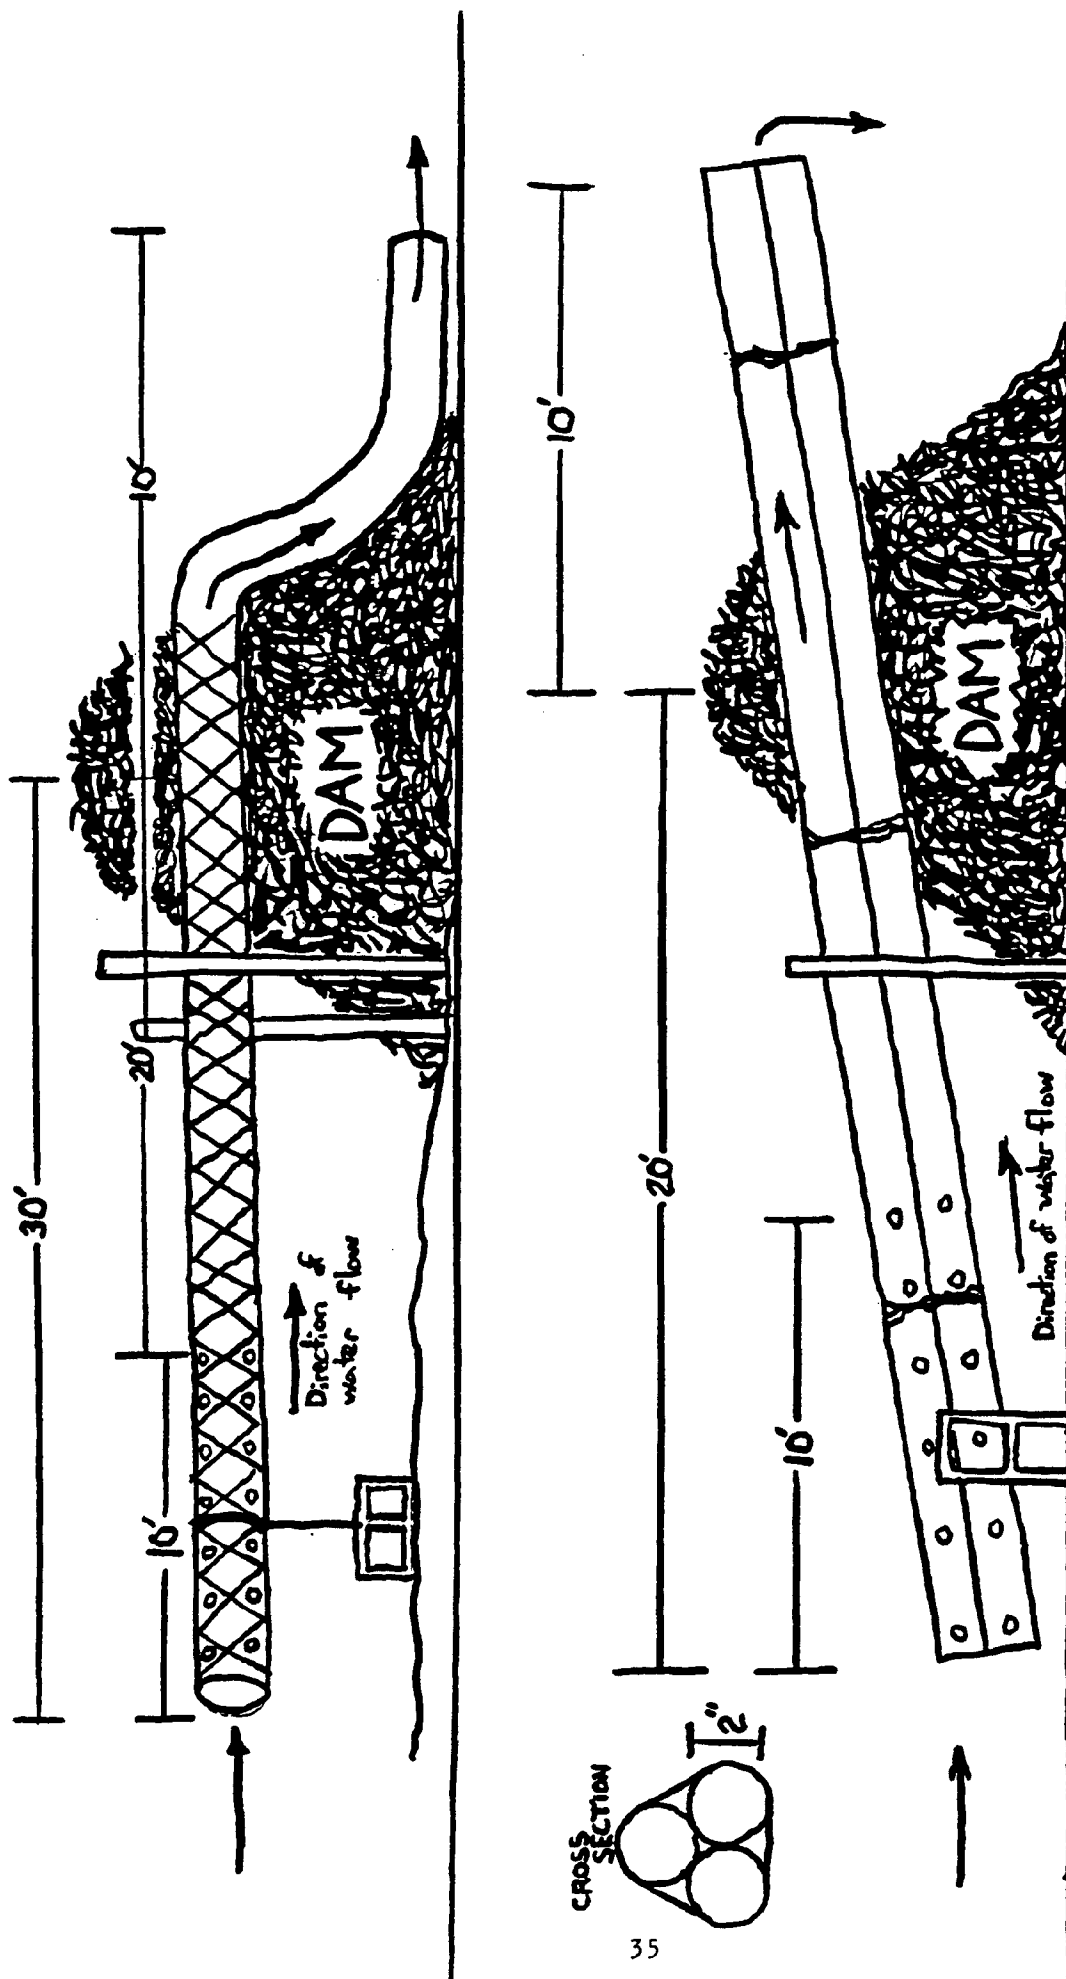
Examples of beaver-flow through pipes using corrugated flexible sewer pipe and PVC pipe
